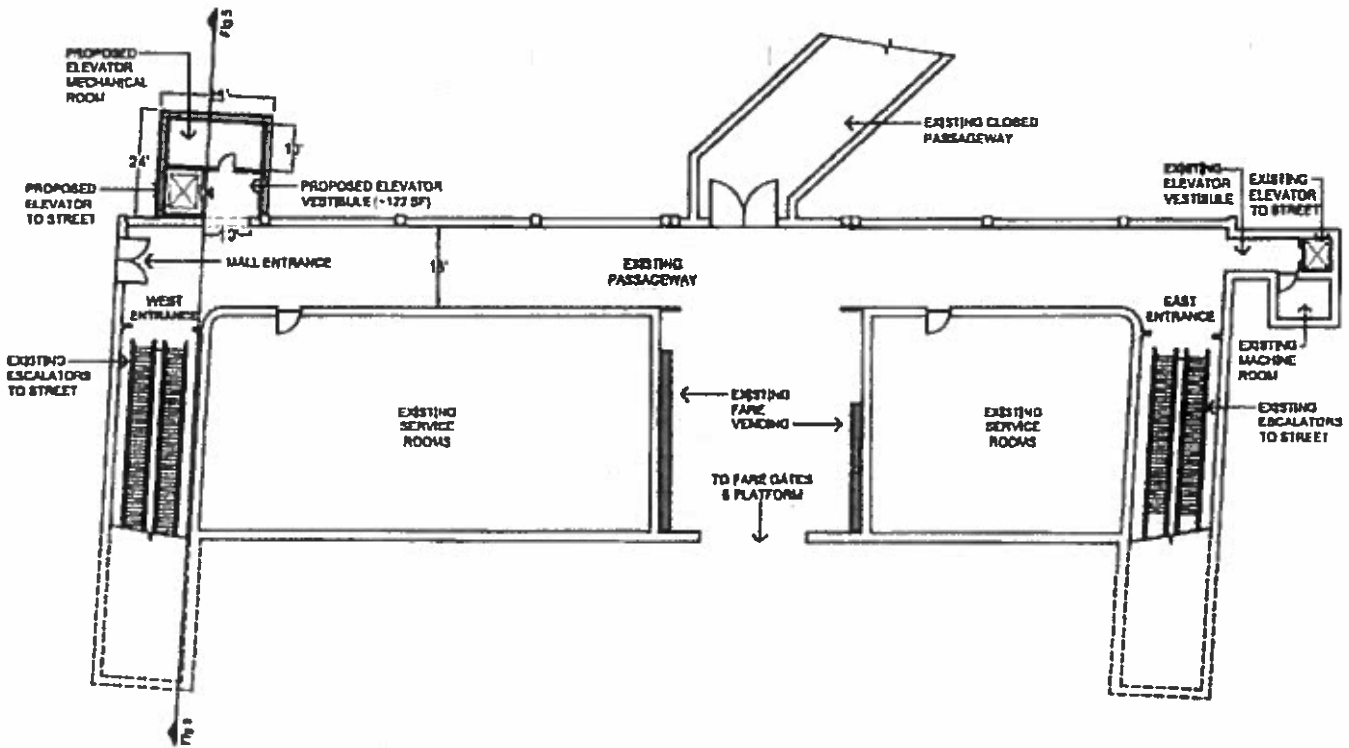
Existing Conditions - Passageway/Mezzanine Level
